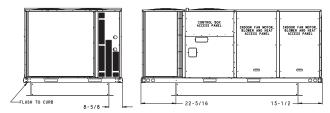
Retrofit Installation Dimensions (Size 16 Shown)
